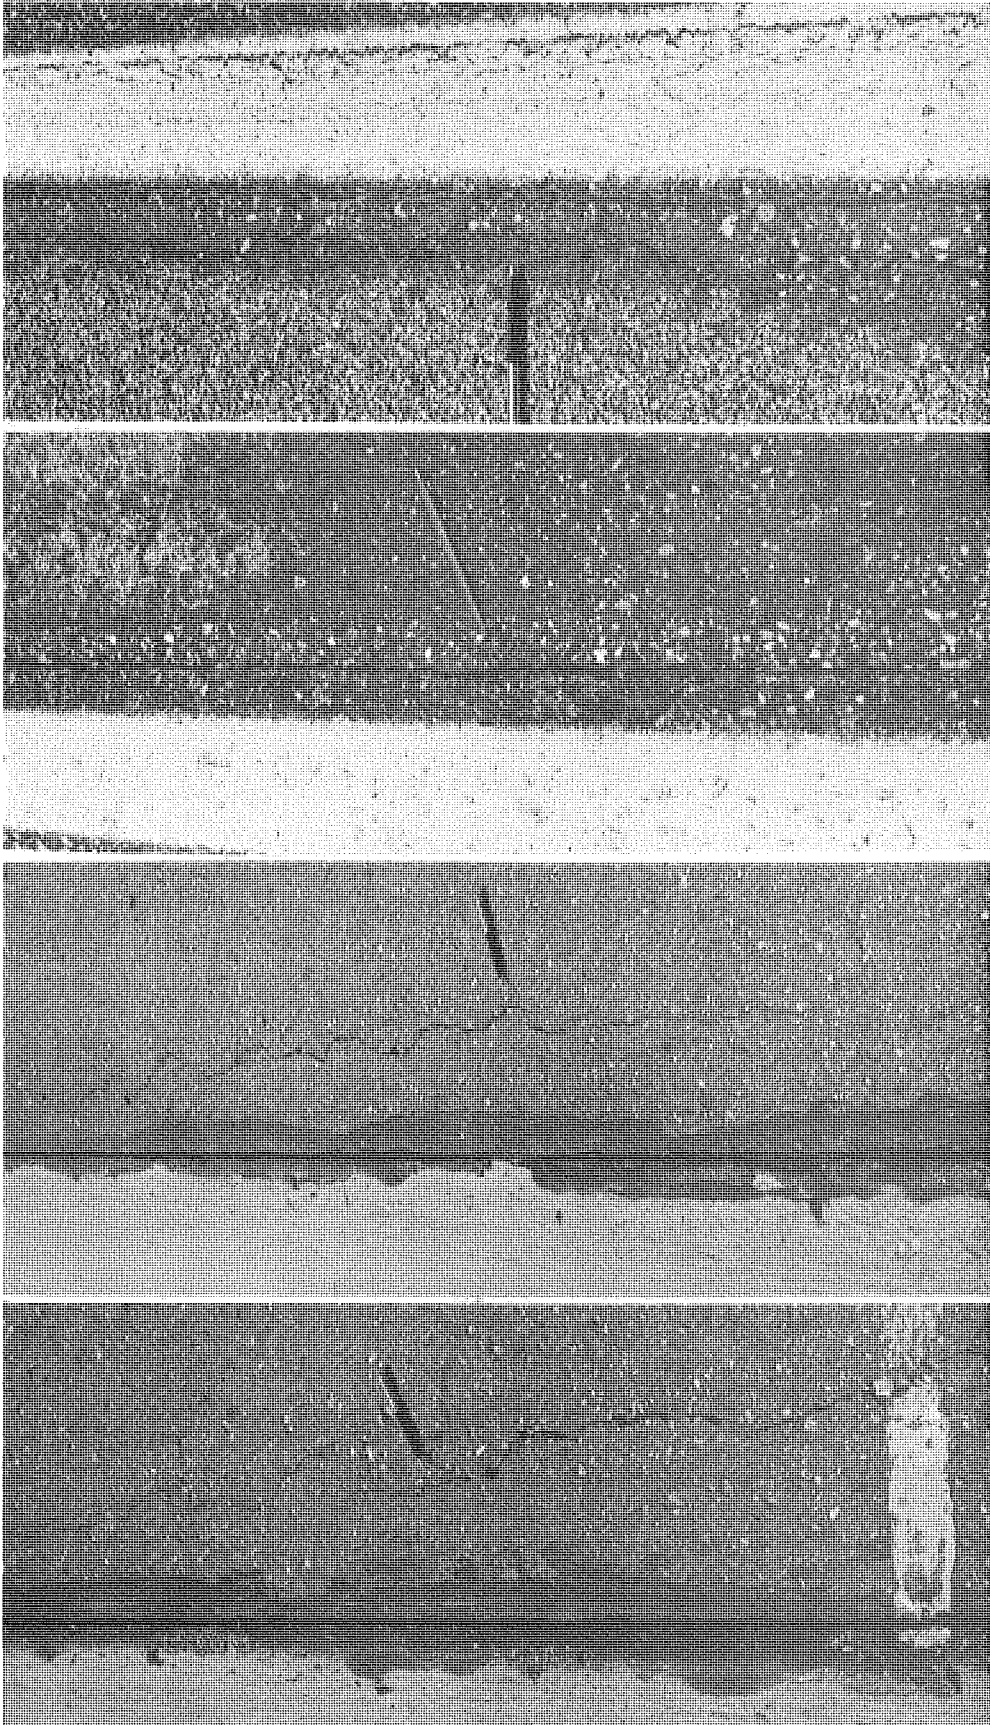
Good performance of sealer in 1/8-in. wide sawed longitudinal joints. At left, in two views at adjacent locations, joint and sealer remain in good condition although 10-ft crack, opened 1/4 in., has formed 6 in. from joint. At right, two views of bituminous shoulder adjacent to concrete pavement with bituminous overlay show good adhesion of sealer. At far right, crack 30 to 40 ft long has opened 3 to 6 in. from sound joint.
